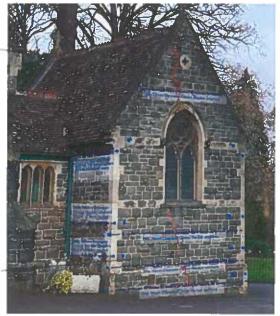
Structural cracking around the east elevation north window (external)
